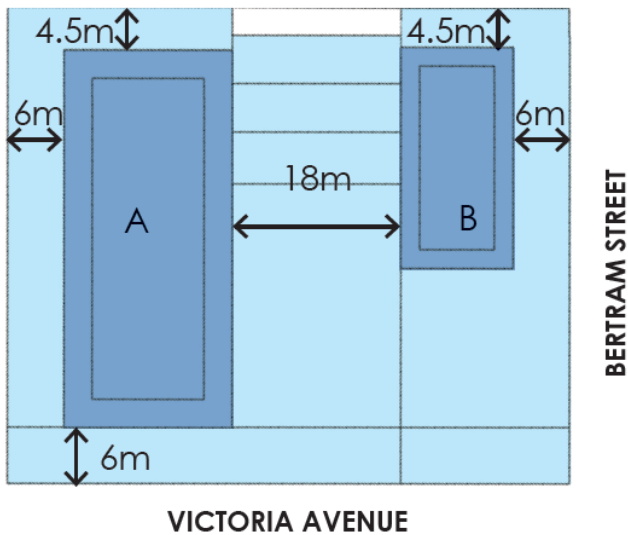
Site plan of block bounded by Bertram Street and Neridah Street and Victoria Avenue (source: APlus Design Group)
